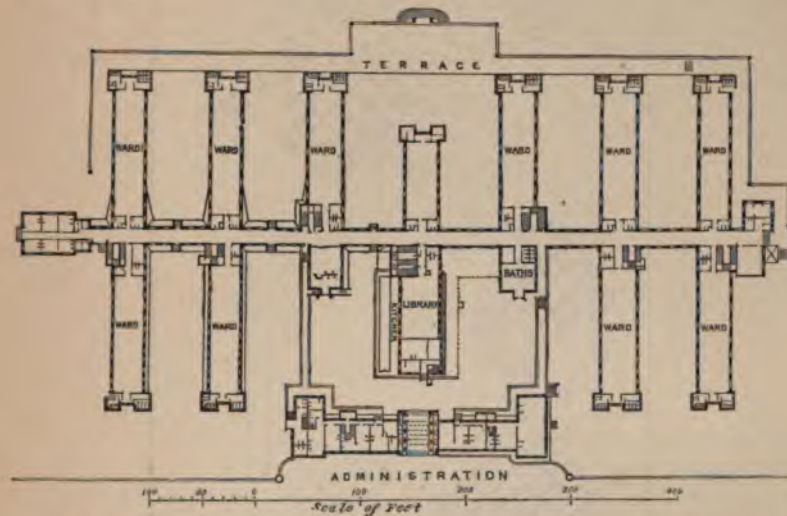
Ground Plan of the Herbert Hospital, Woolwich (from Miss Nightingale's book).
